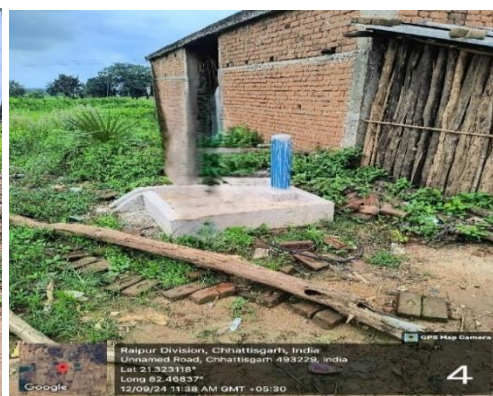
FHTC constructed, laying of distribution line not done and composite pipe lying open without connection (Kamardera habitation, Village-Bhithidih)
